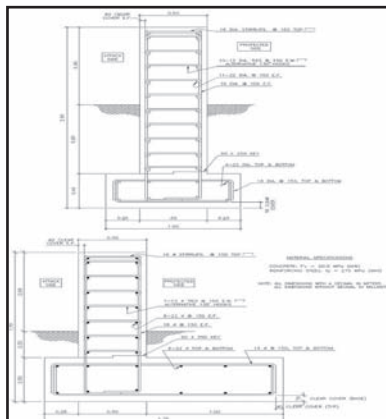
Anti-Ramming Walls. Left: Foundation wall; Right: Knee wall. (UFC 4-022-02)
